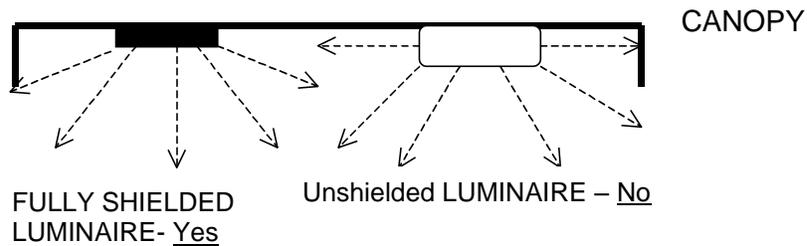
Building canopies, overhangs, roof eaves and similar types of construction shall not be considered as the means for providing the light cutoff. The cutoff characteristics shall be achieved by the LUMINAIRE itself.
